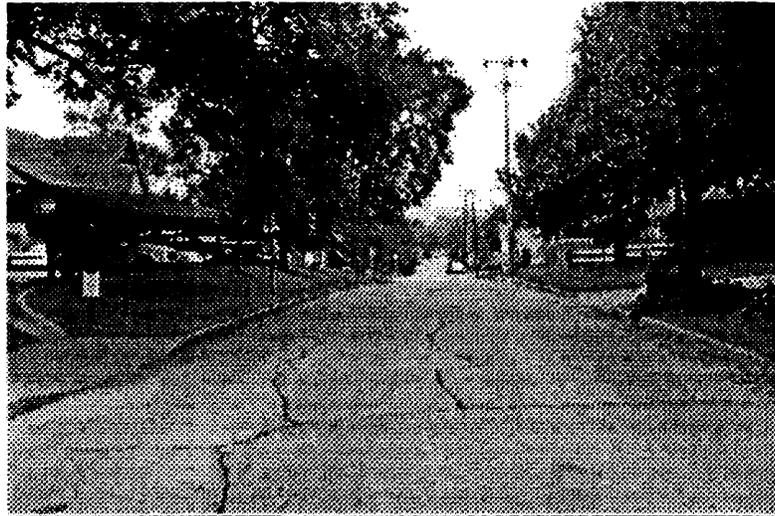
, South Boston Avenue at Woodward Avenue, looking north.
